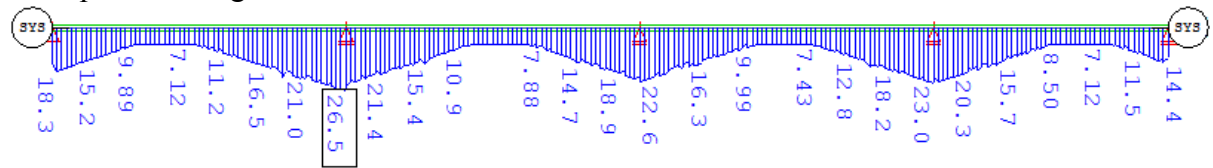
Stirrup reinforcement after 3rd optimization step, segment phase, concrete variant
